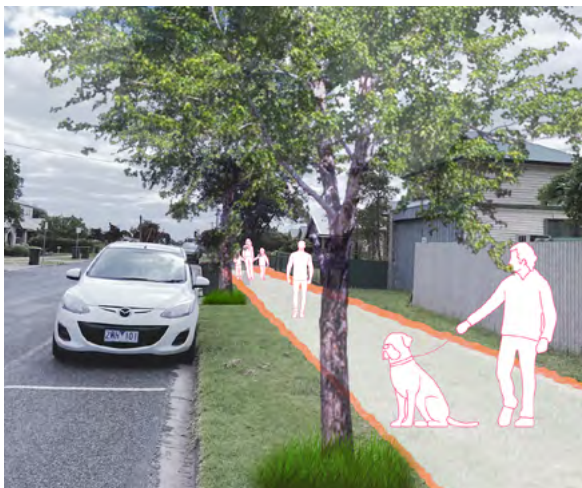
Add missing footpaths and street trees on Glead Street to better connect the recreational facilities on the western edge of the CAD.
